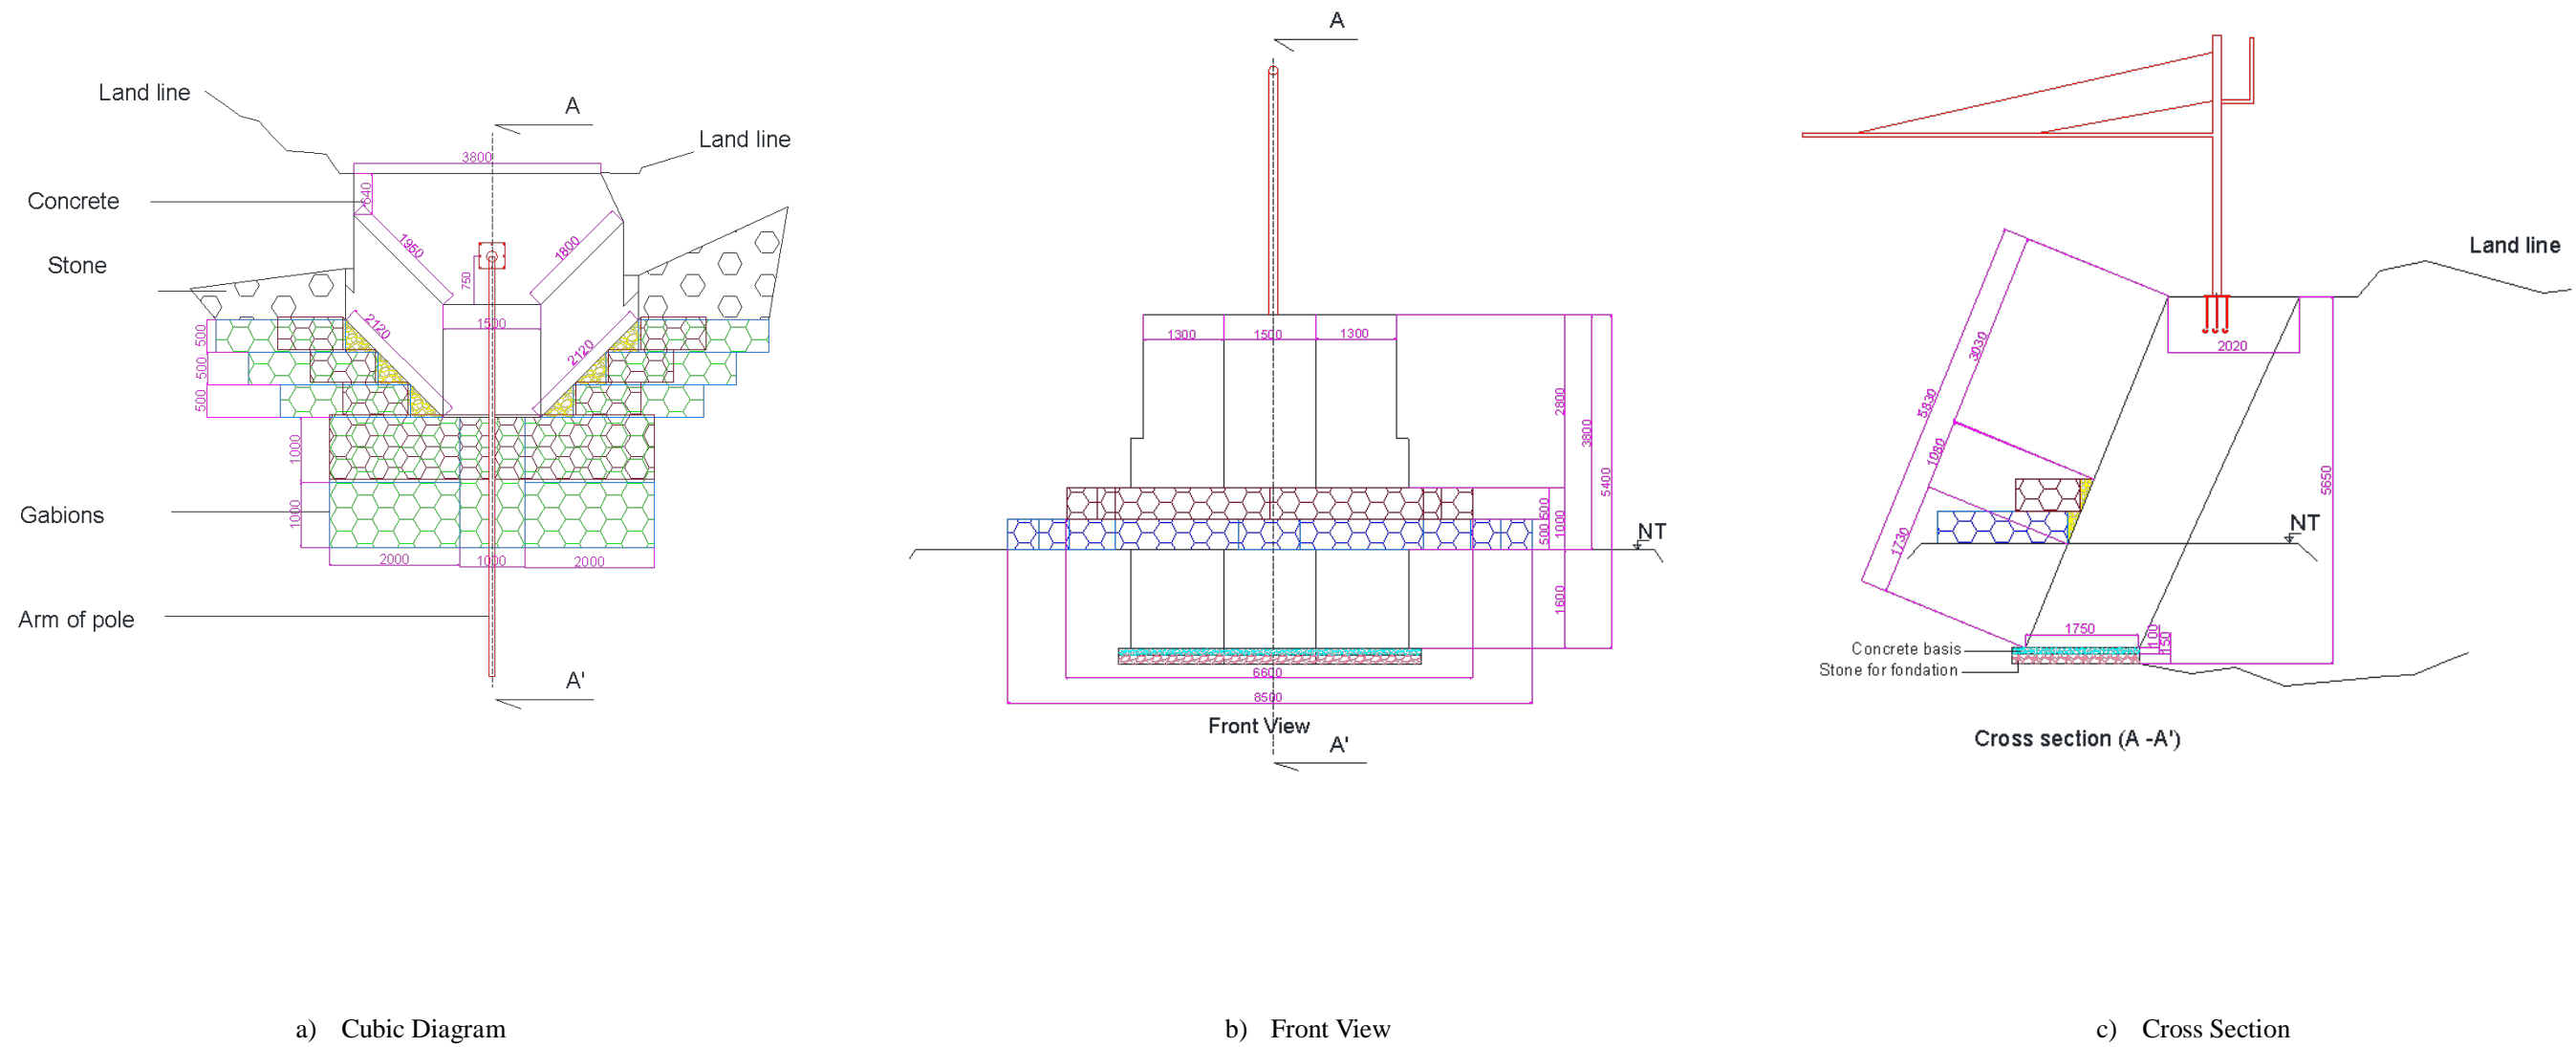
As-built Drawing of Foundation/Sub-structure
